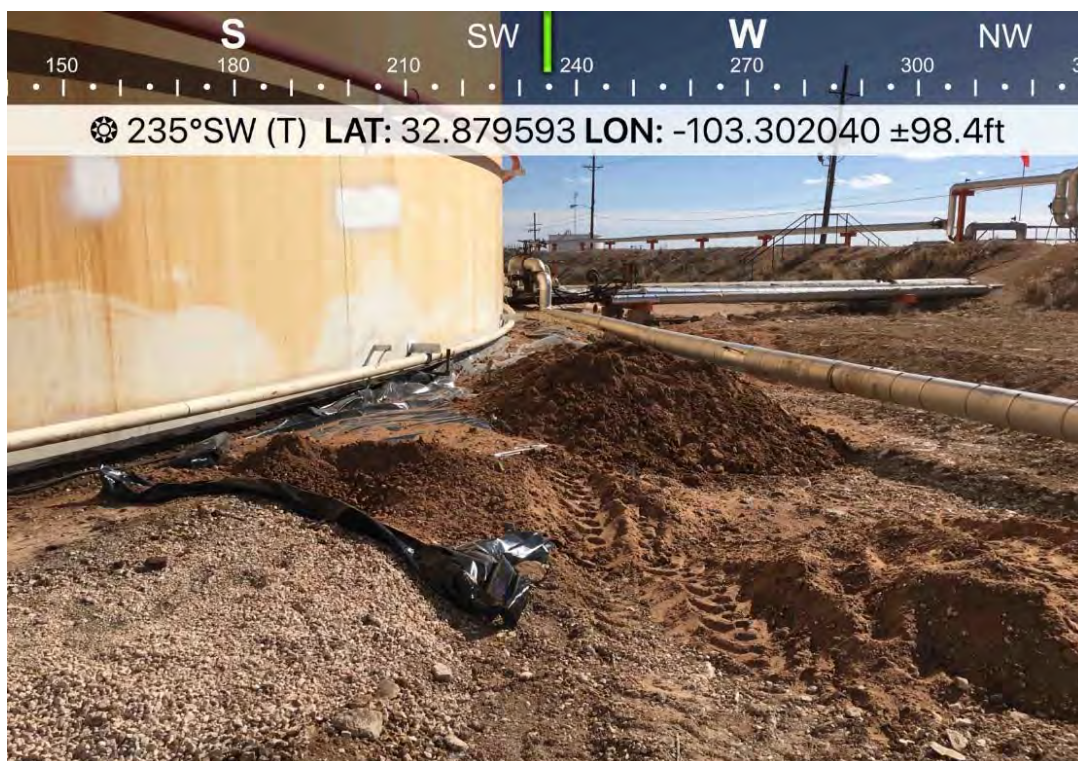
West/southwest side of Tank 1206, during backfill above plastic liner.
